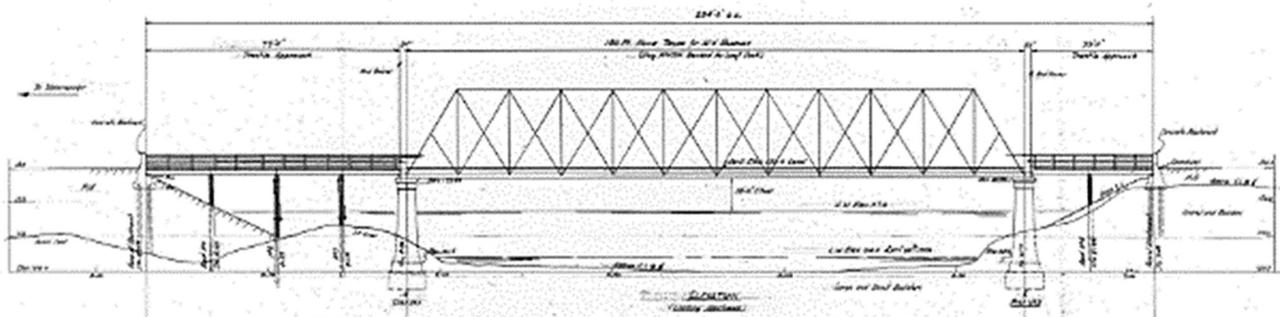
Old Chehalis Bridge: Timber Howe Truss with timber approach spans [BC MoTI]
